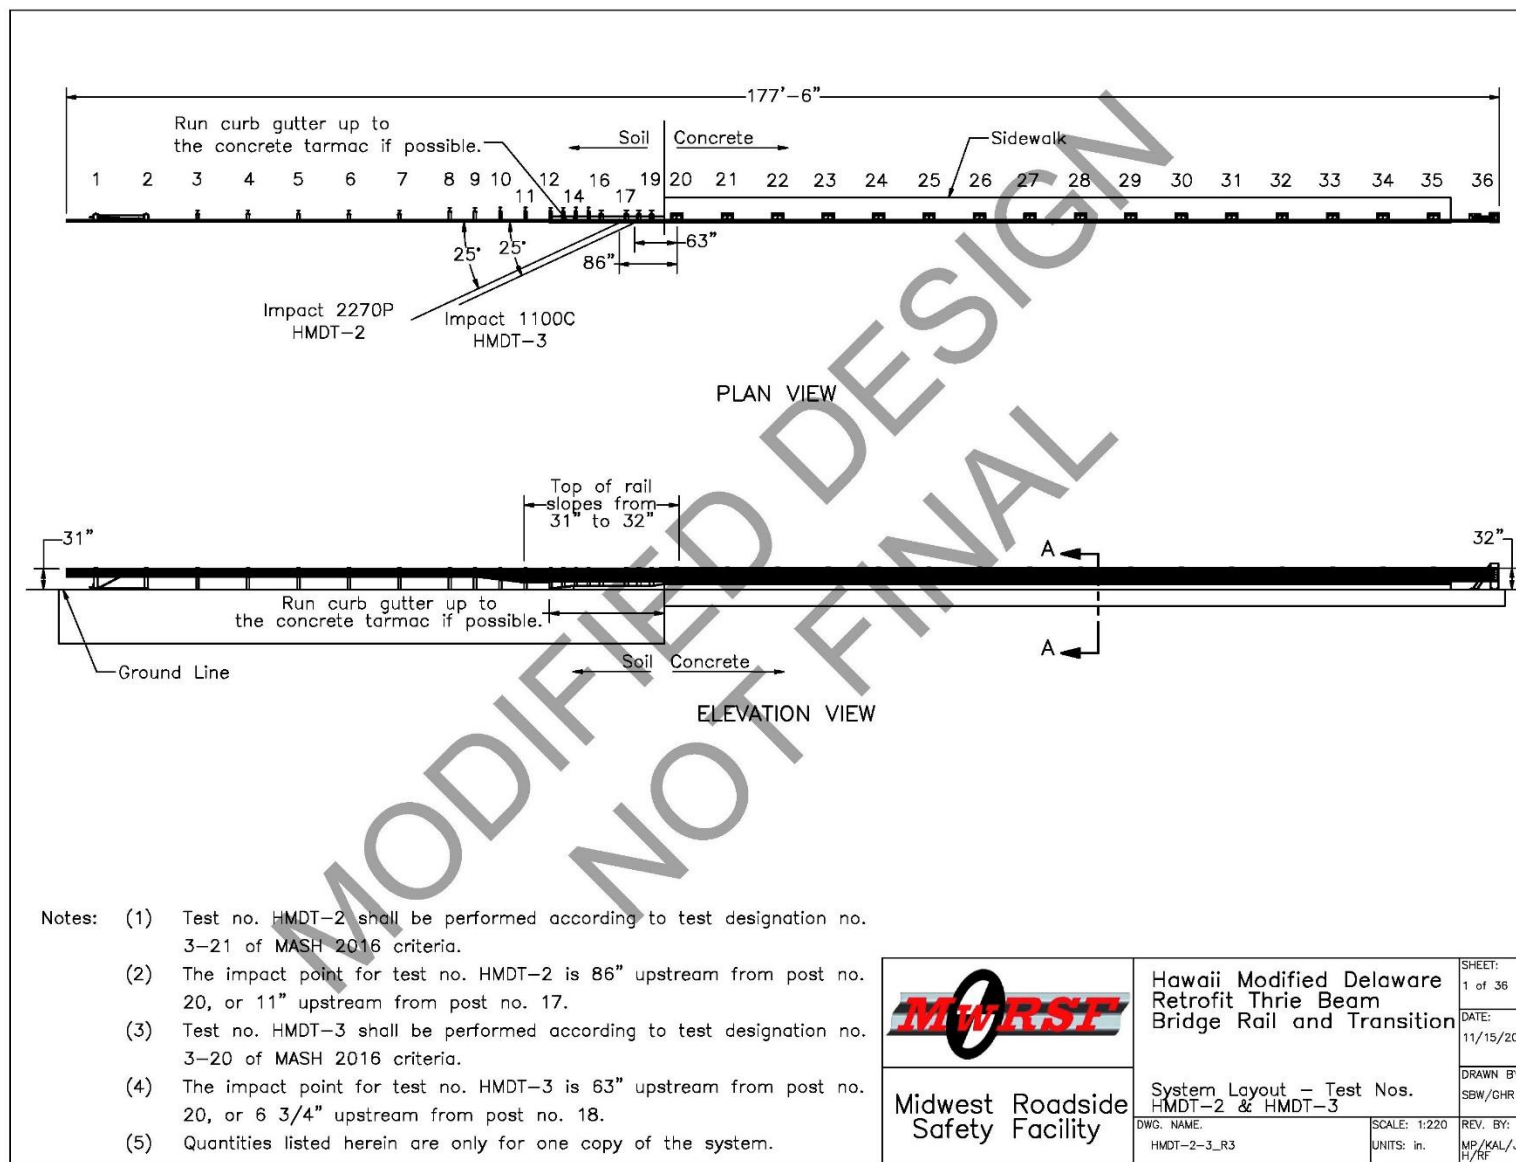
Test Installation Layout, Test Nos. HMDT-2 and HMDT-3
